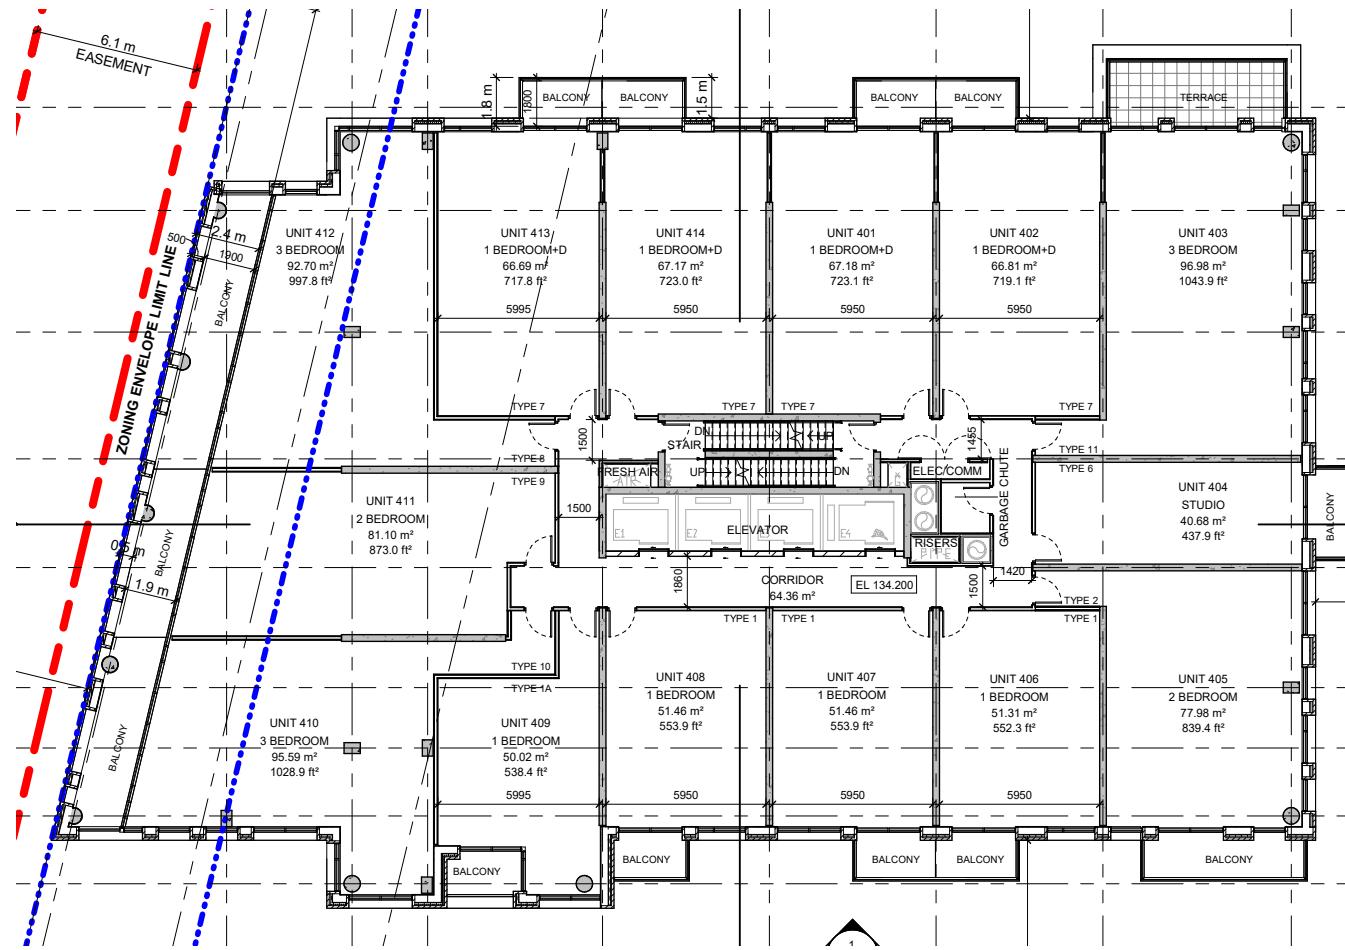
Level 4 Podium Floor Plan (Source: Core Architects)
